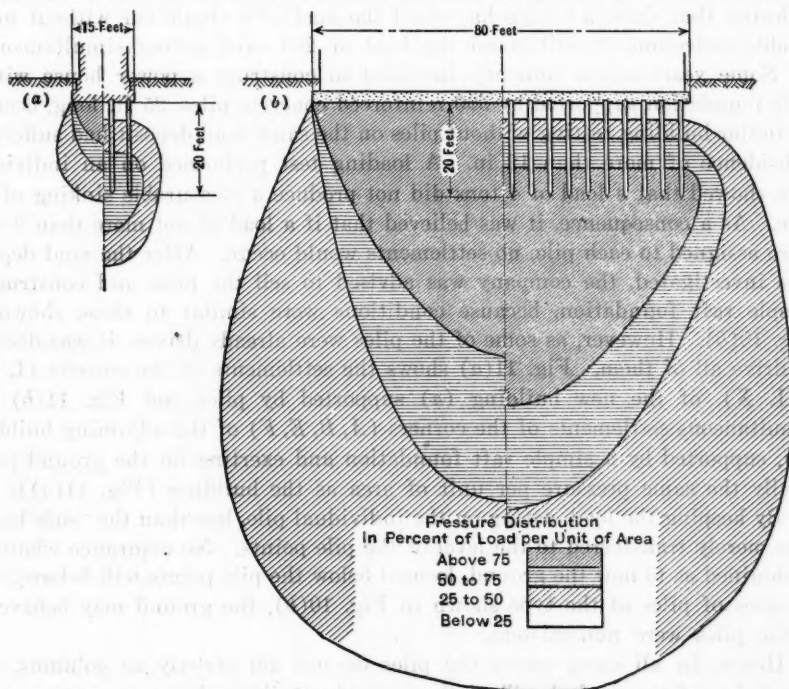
STRESS DISTRIBUTION BENEATH A NARROW (a) AND A WIDE (b) PILE FOUNDATION.
